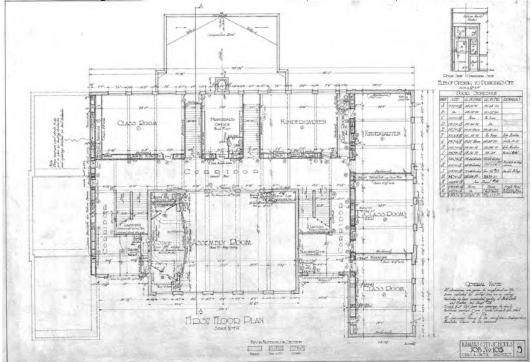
Historic Plans, 1st Floor (now 2nd Floor), 1914.
